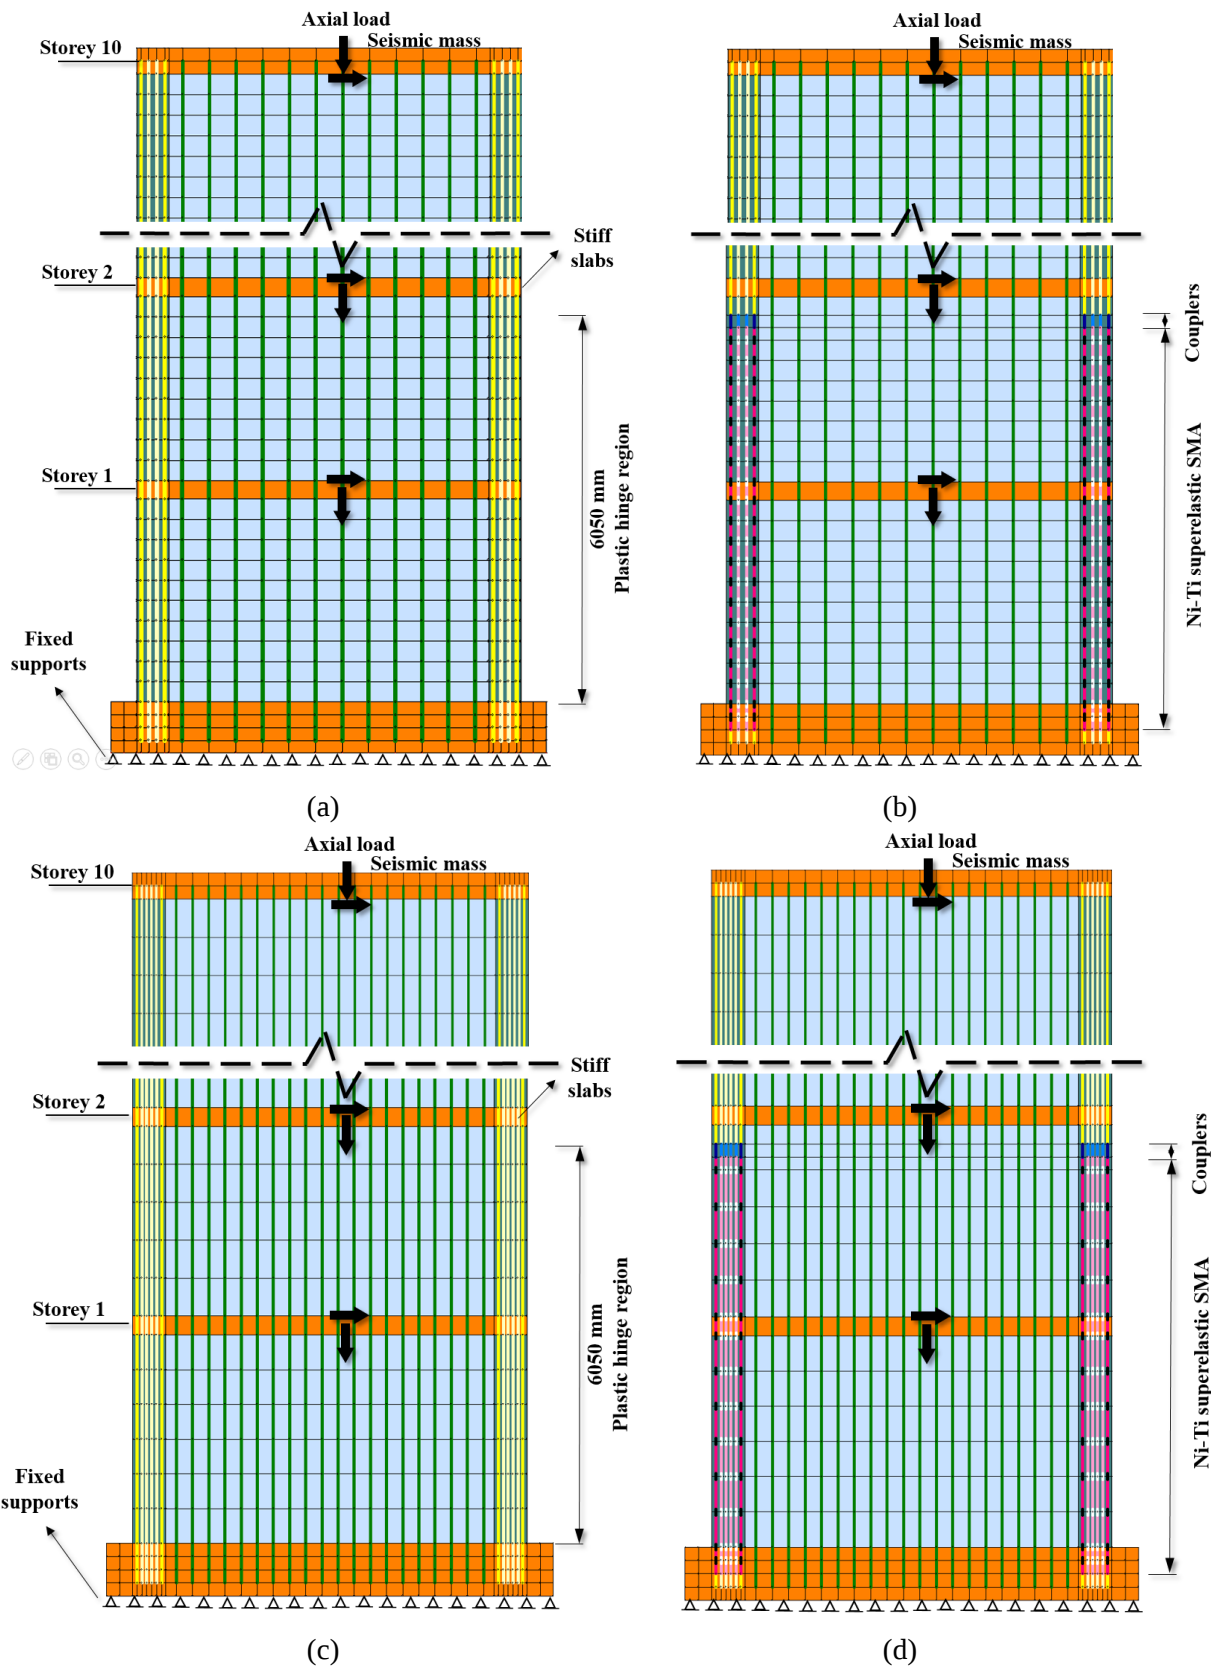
Finite element models in FormWorks (Vecchio et al., 2013) for dynamic analysis of the walls: (a) Wall MDSRW, (b) Wall MDHW, (c) Wall DSRW and (d) Wall DHW
